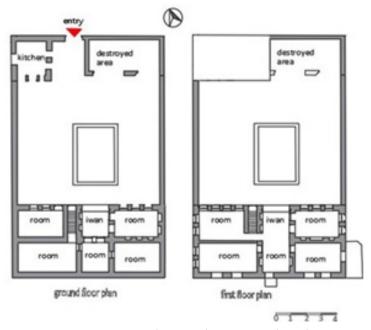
Ferit Köşk (Mansion) Floor Plans (2021)
